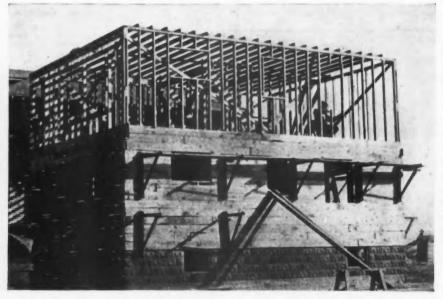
Cutting 18-Foot Studs for Windows Is Another Unnecessary Waste.
